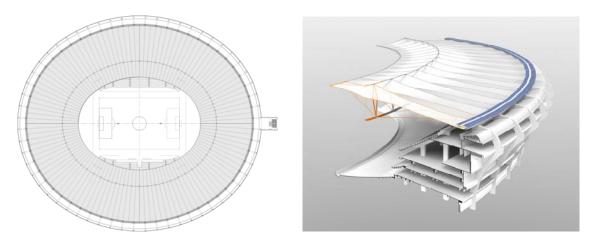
Floor plan and 3D-section of the Maracanã Stadium
